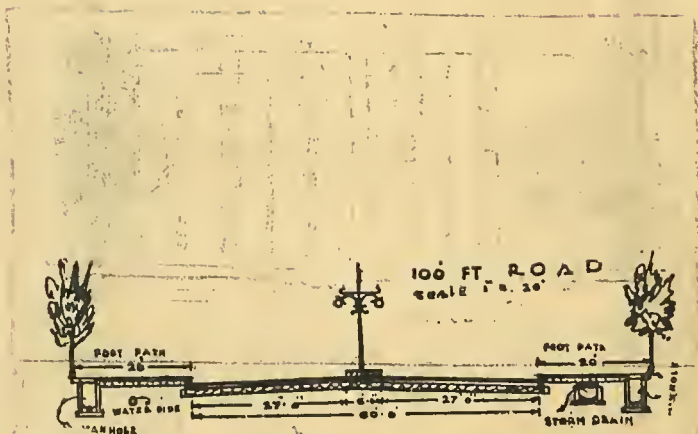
TYPE DESIGN OF 100 FT. ARTERIAL ROAD.
